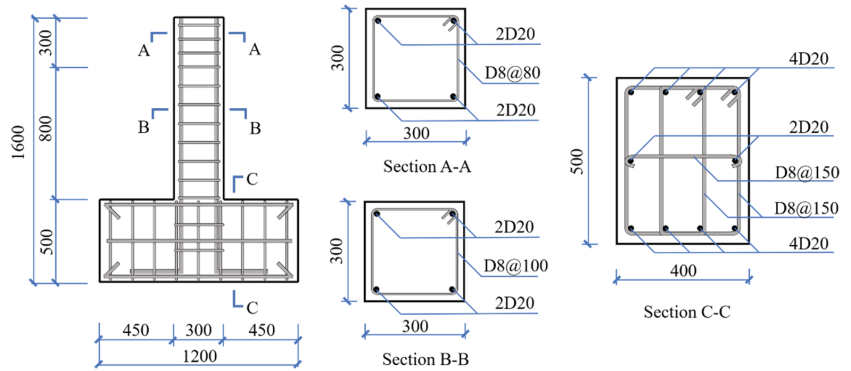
Specimen details (unit: mm). Note: section A-A, section B-B and section C-C in the figure are the reinforcement details of the corresponding positions of the specimen respectively.
